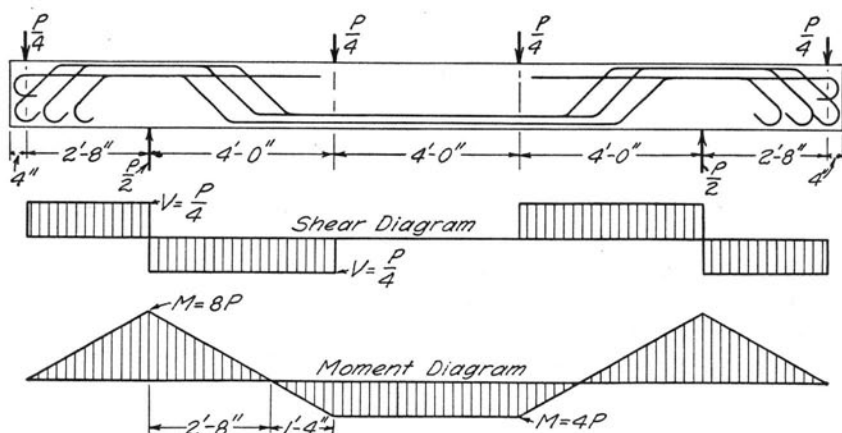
SKETCH OF TYPICAL BEAM, SHEAR, AND MOMENT DIAGRAMS
